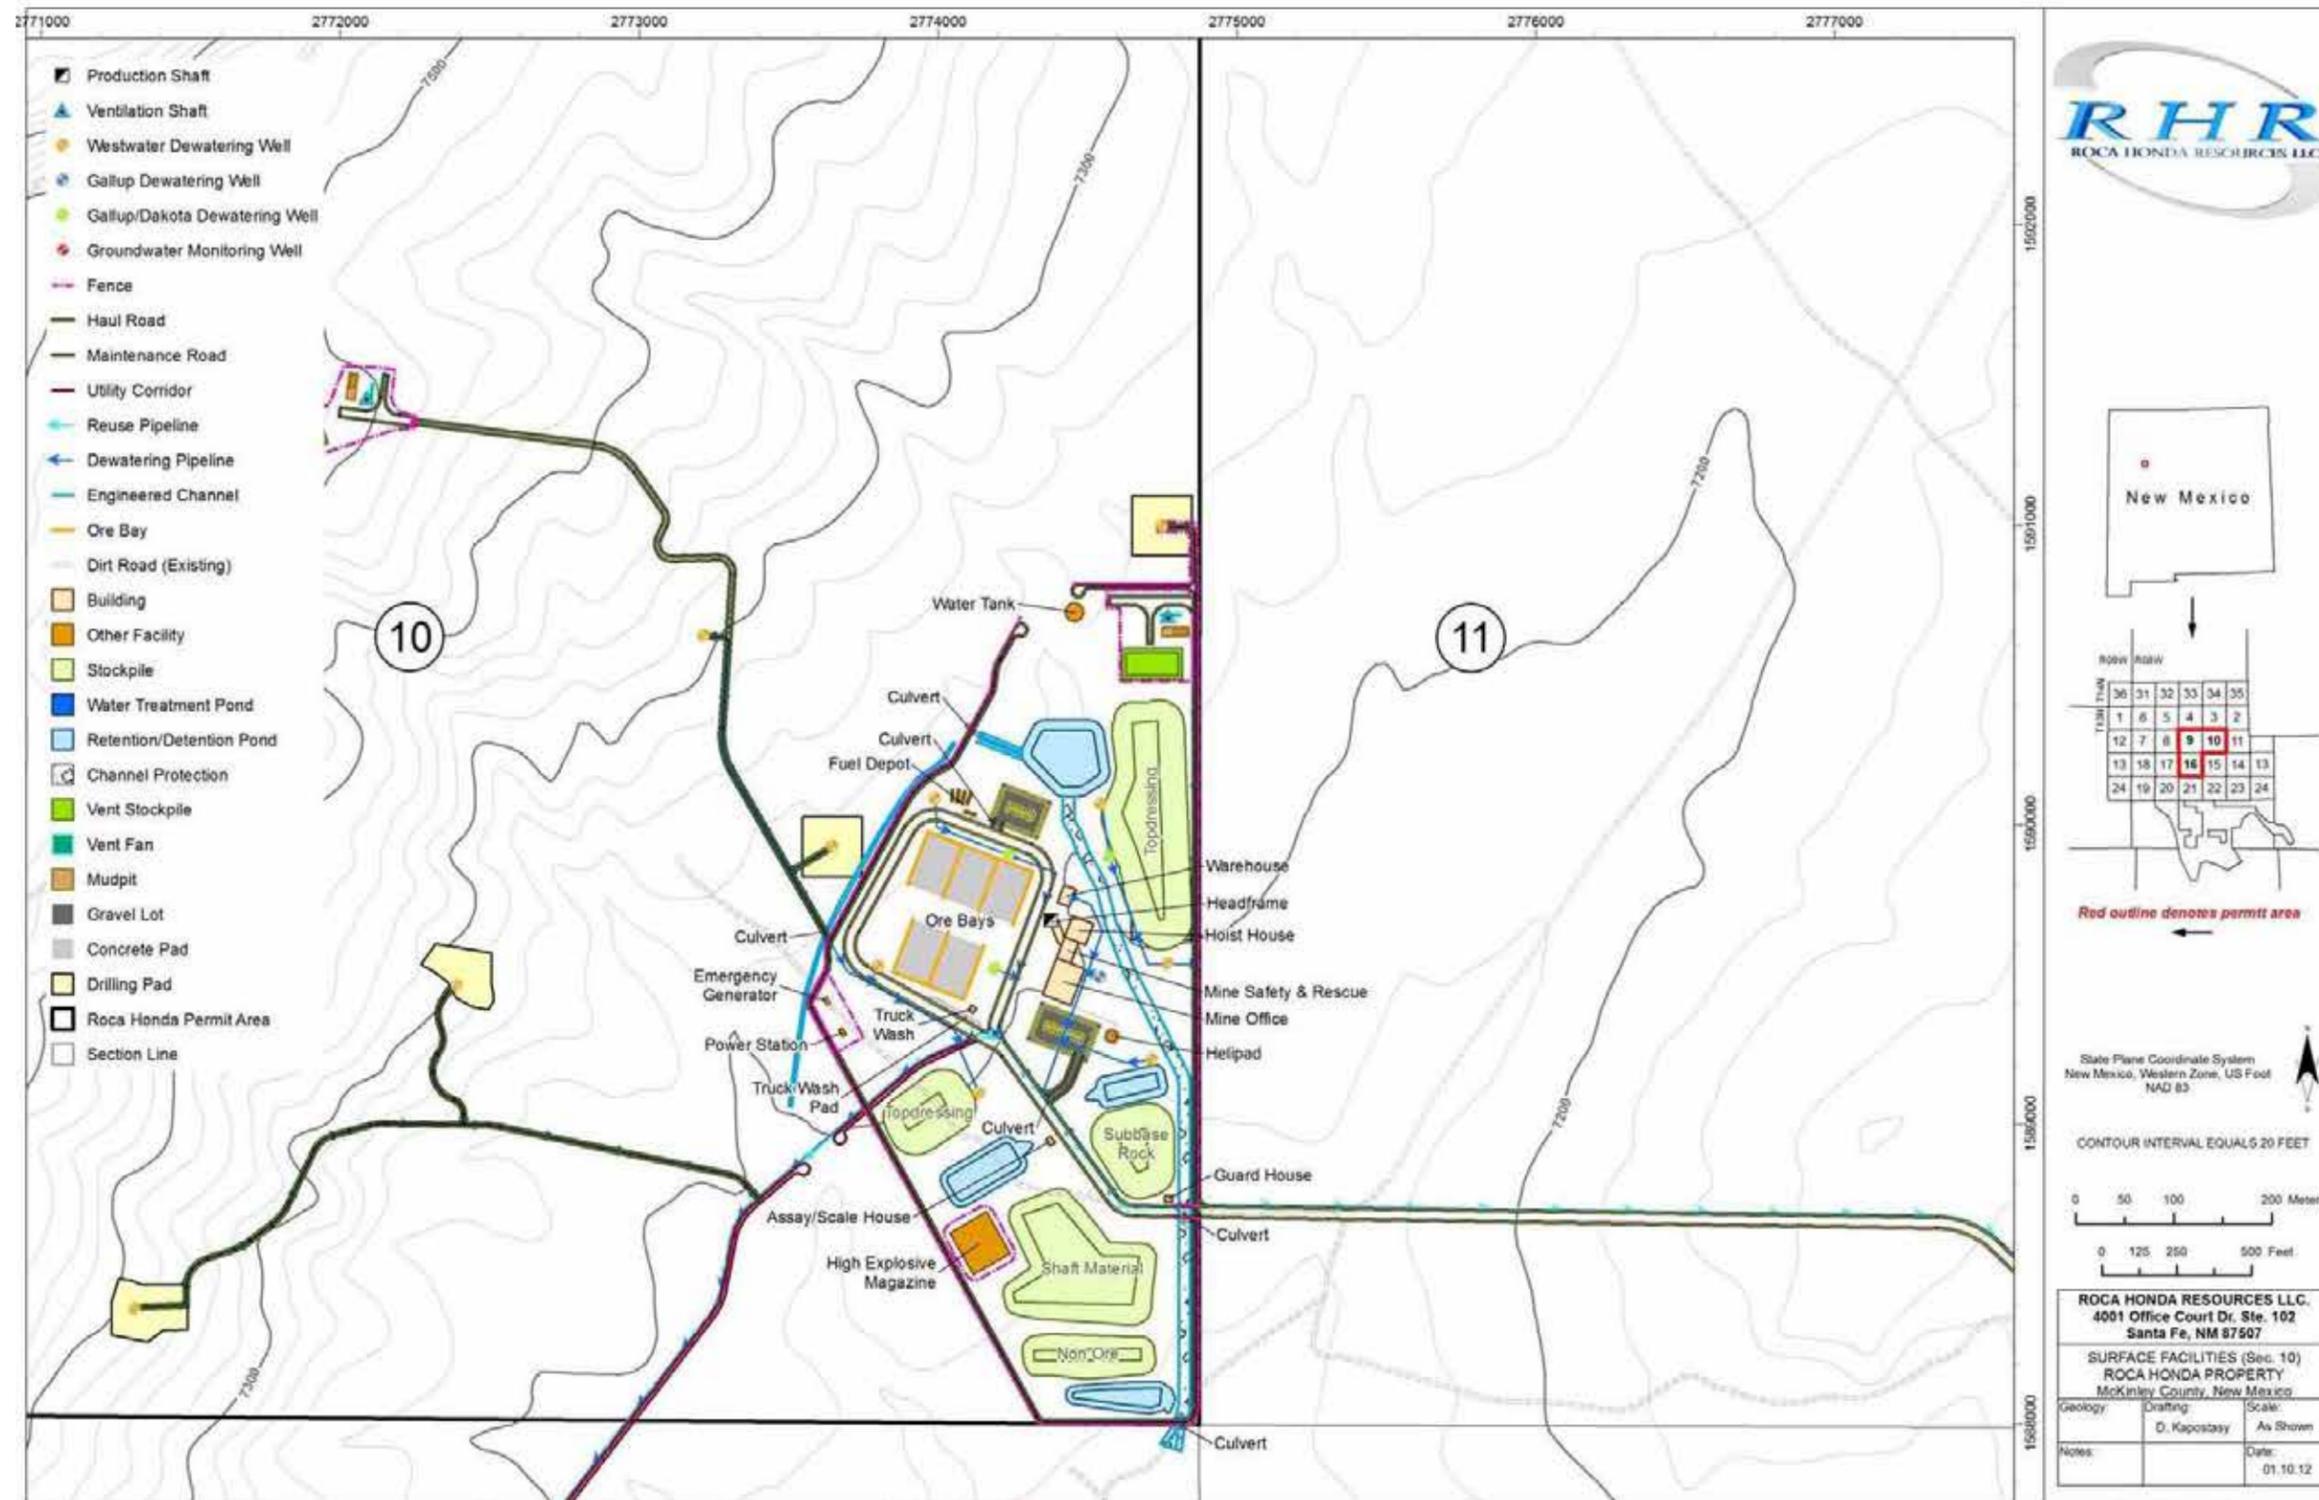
Layout of surface facilities in Section 10 for the proposed Roca Honda Mine
